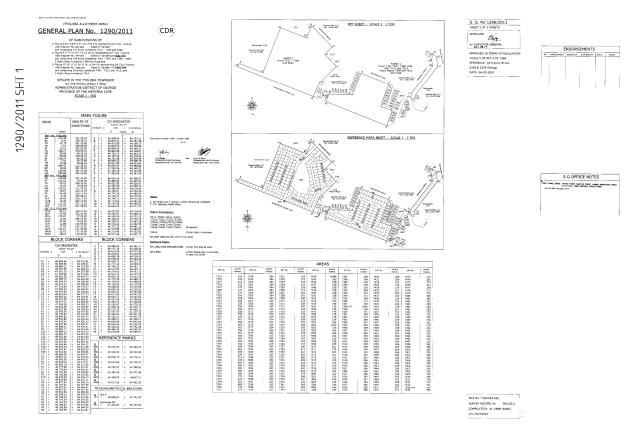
General Plan 1290/2011 - Sheet 1 (Erf 7231 & 7223)
